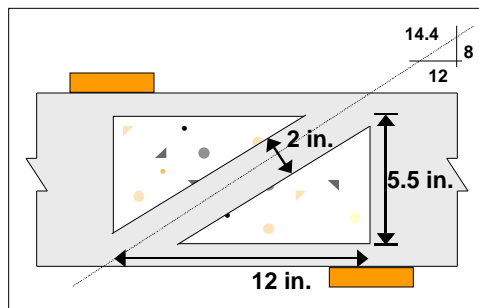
Specimen 8.DC, Steel Tension Tie
